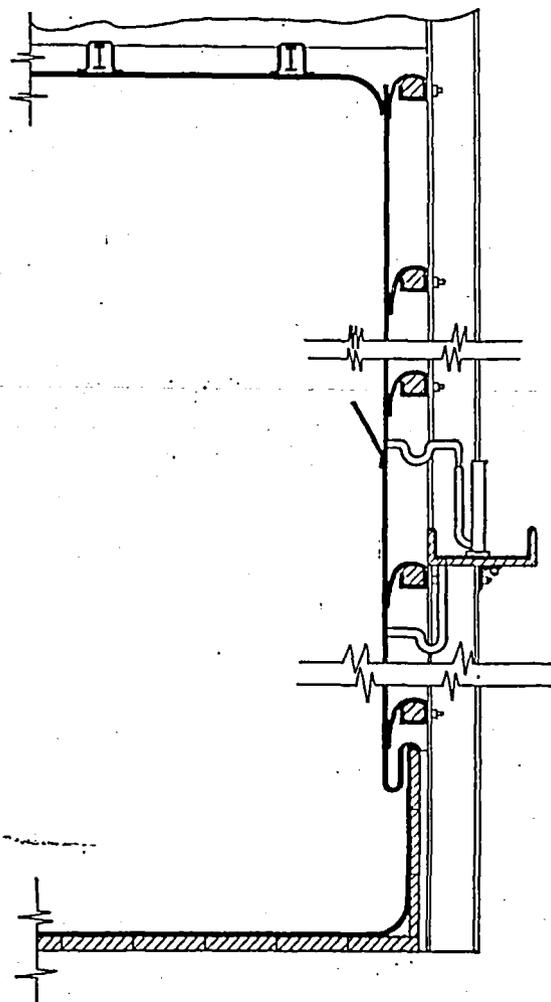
Details of chamber-plant construction: chamber construction.
